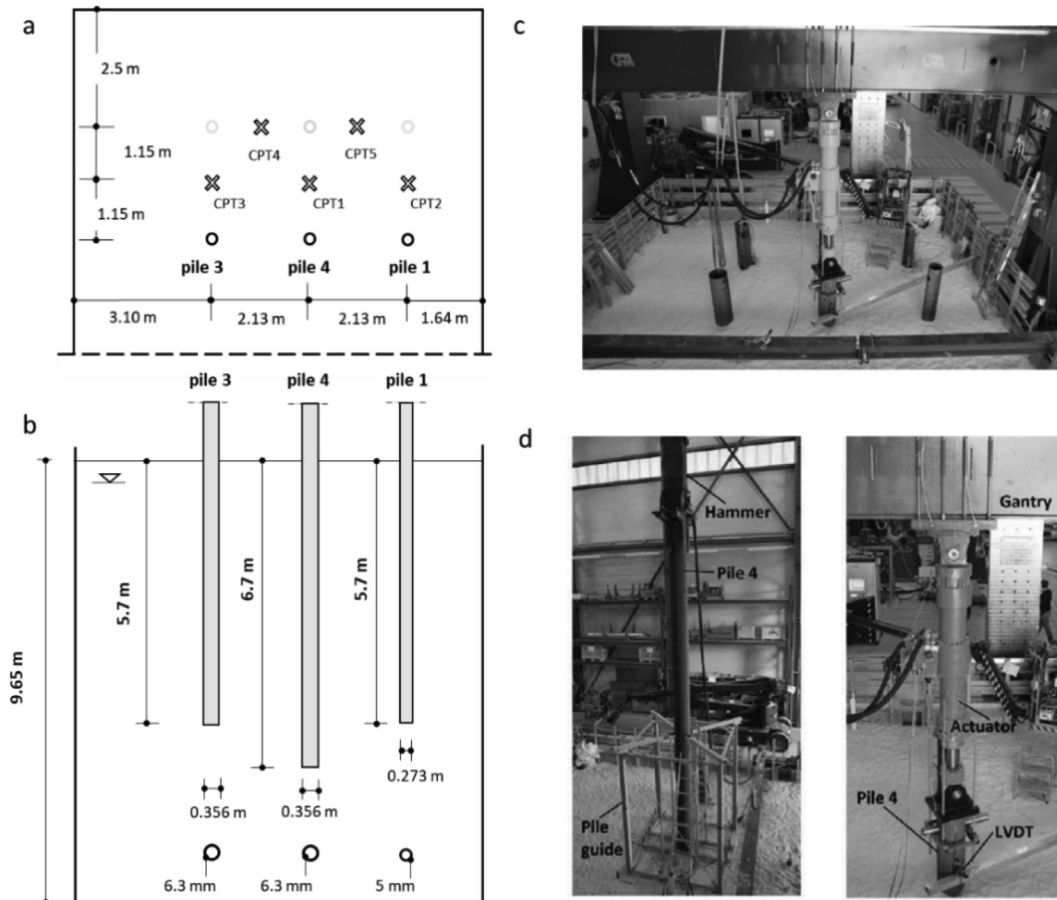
Schematic drawing of the experimental set-up a) top view, b) section and pics of the piles, c) the pile layout and d) installation and loading.
